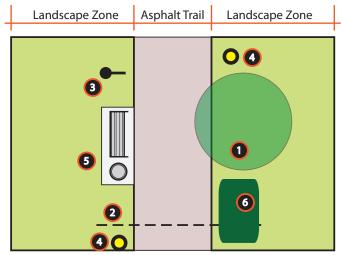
Elmwood Connector Plan-Section: Full Level of Development
